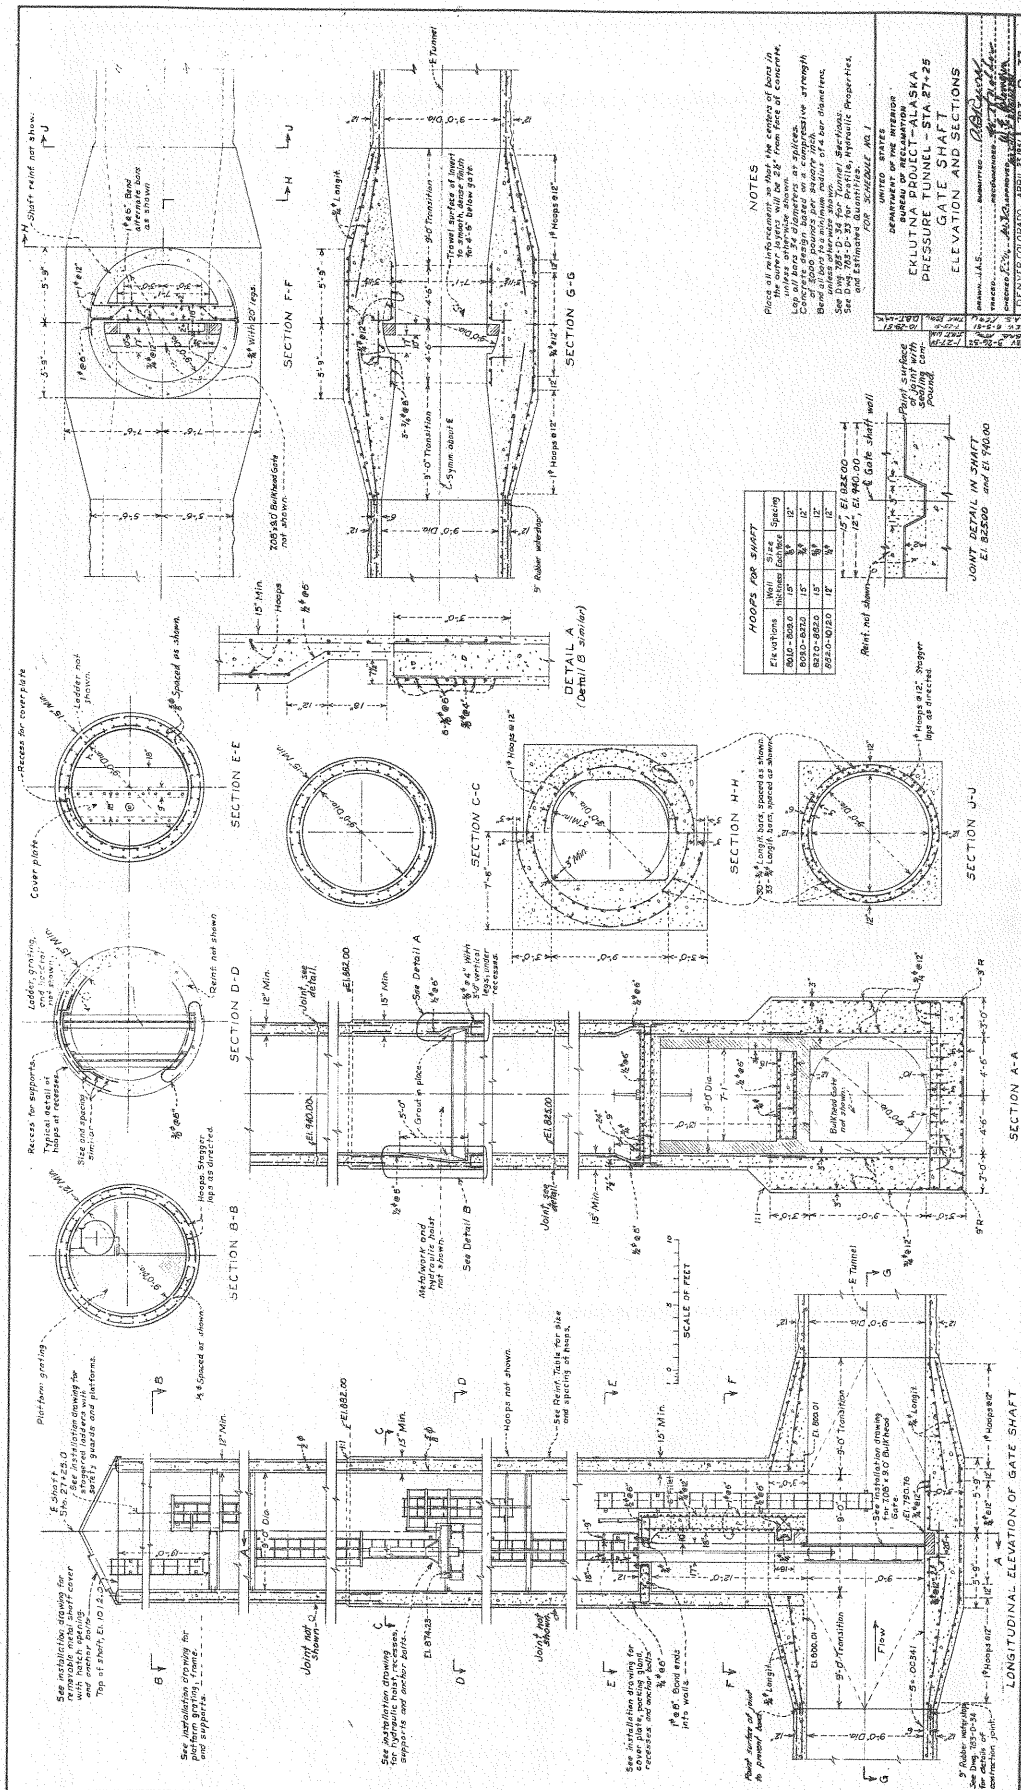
Elevations and sections of pressure tunnel gate shaft.
